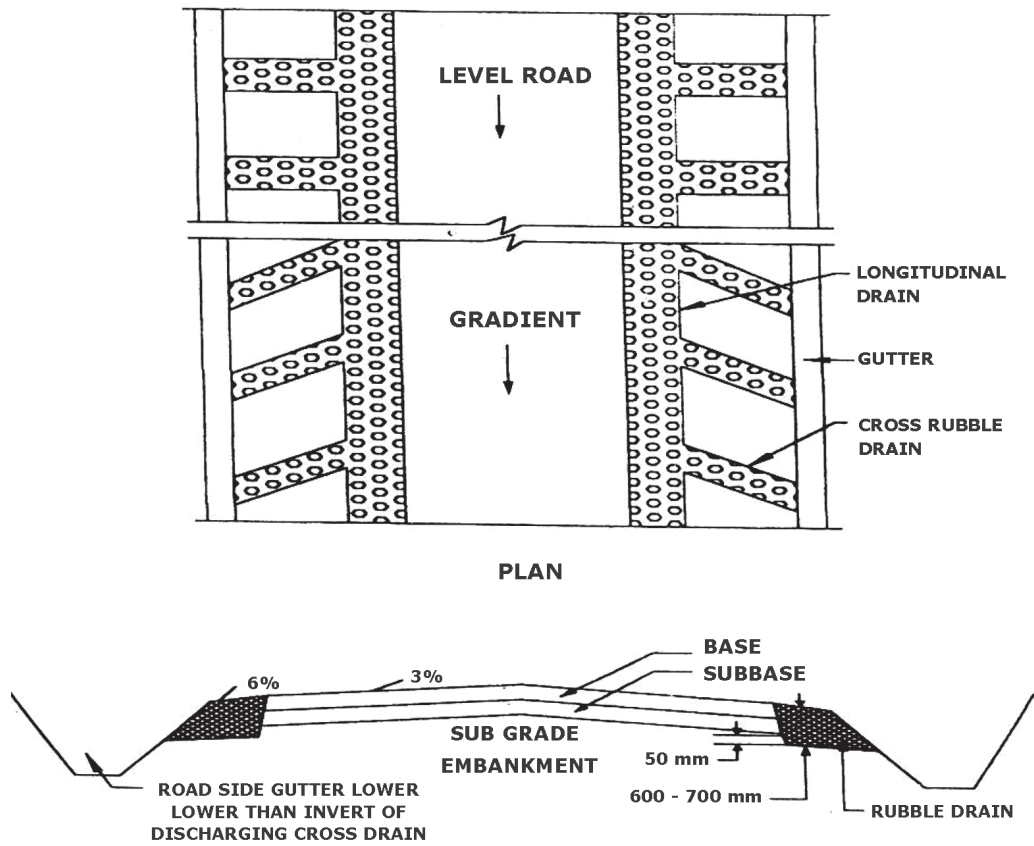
Shoulder Drainage by Longitudinal and Diagonal Drains
